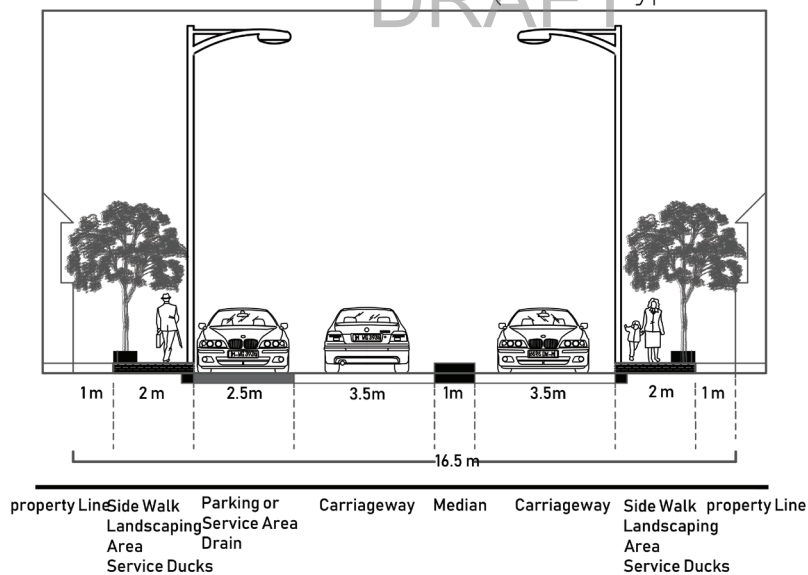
Cross section of a Level 02 – General Road - (Road Type – 2–B)
